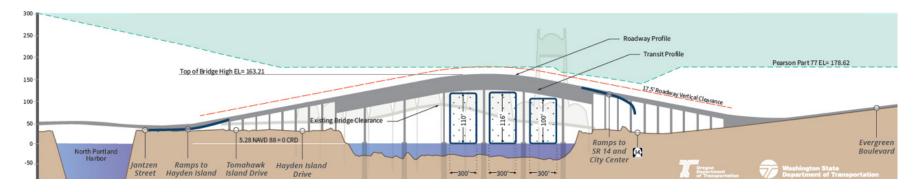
Bridge Profile: Mid-level Fixed Span Bridge
